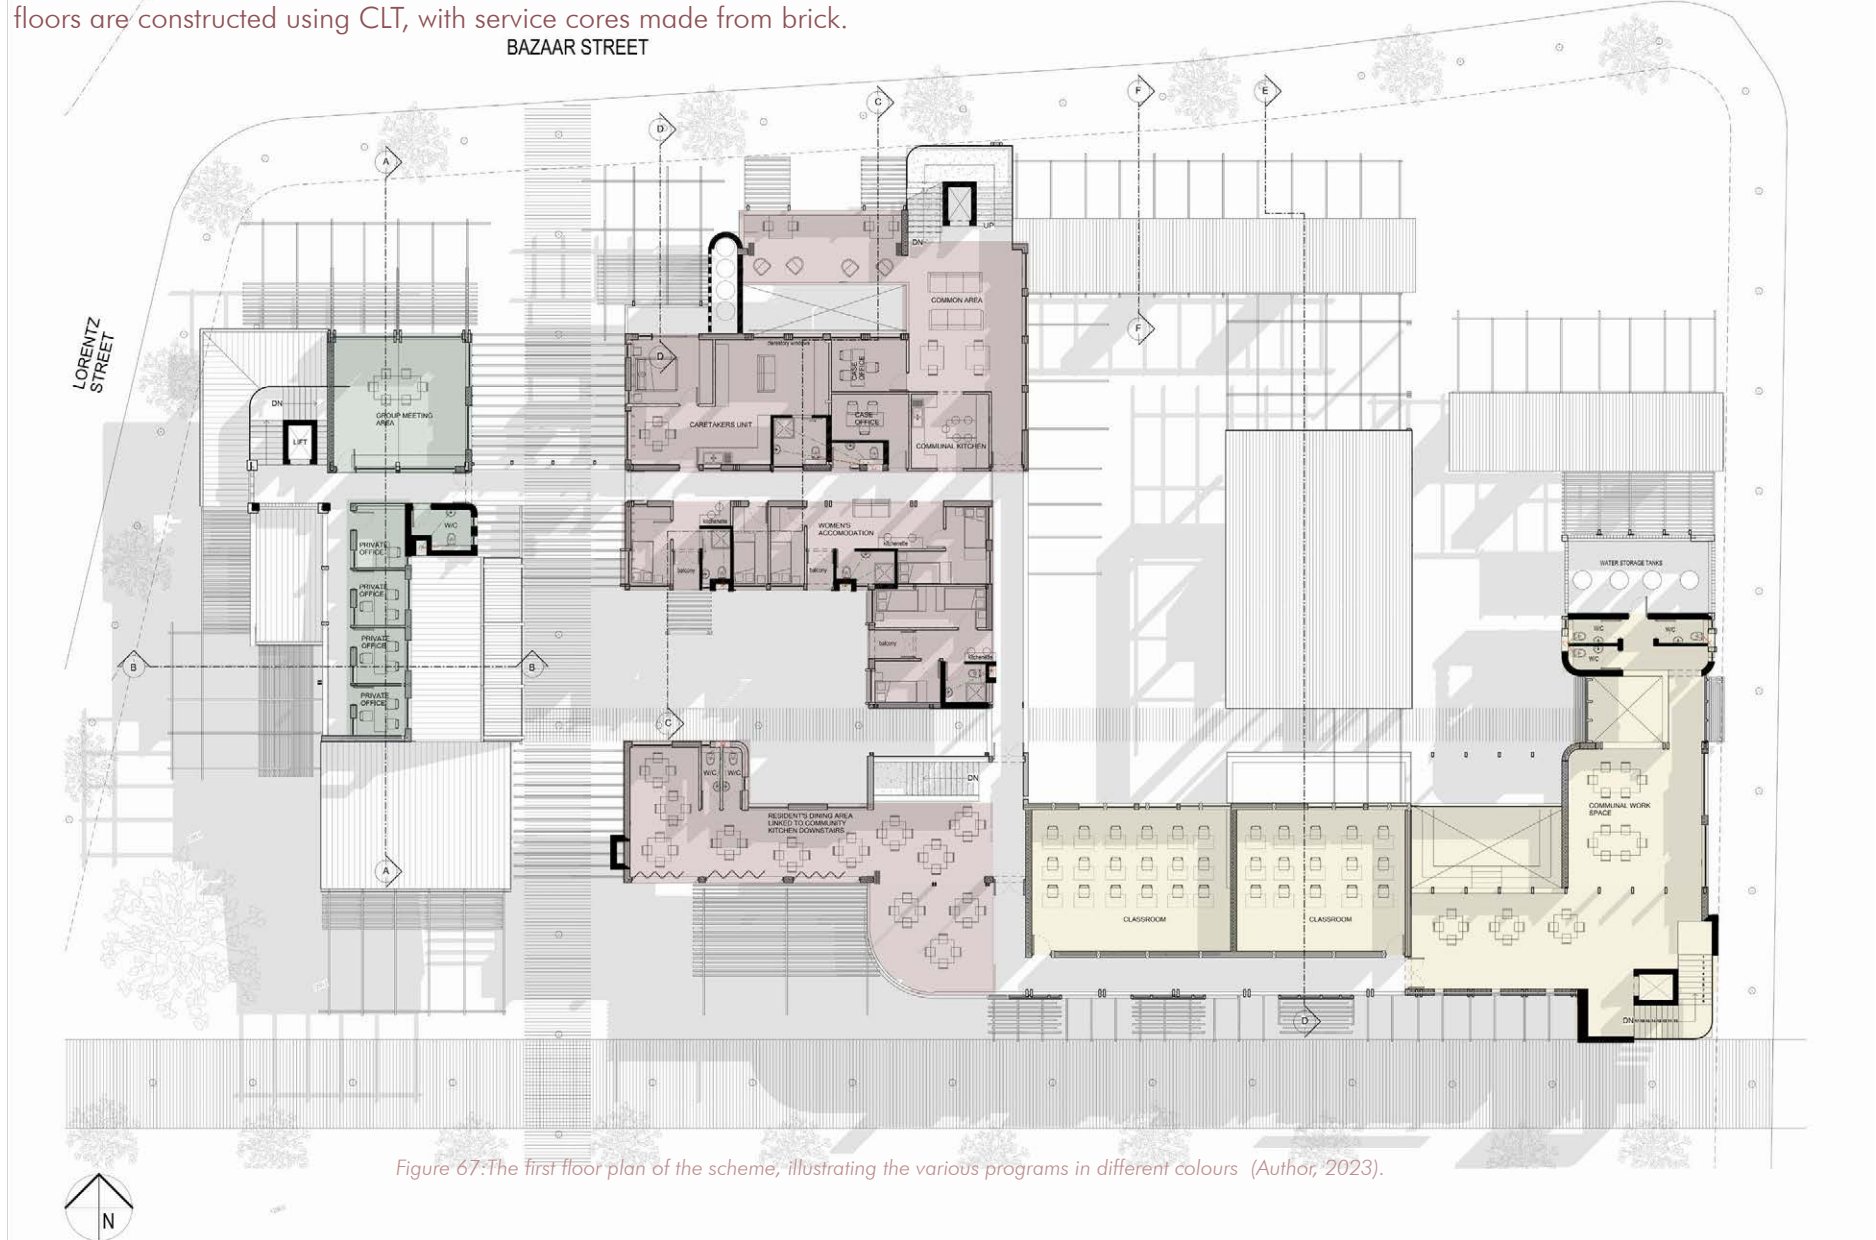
The first floor plan of the scheme, illustrating the various programs in different colours (Author, 2023).
